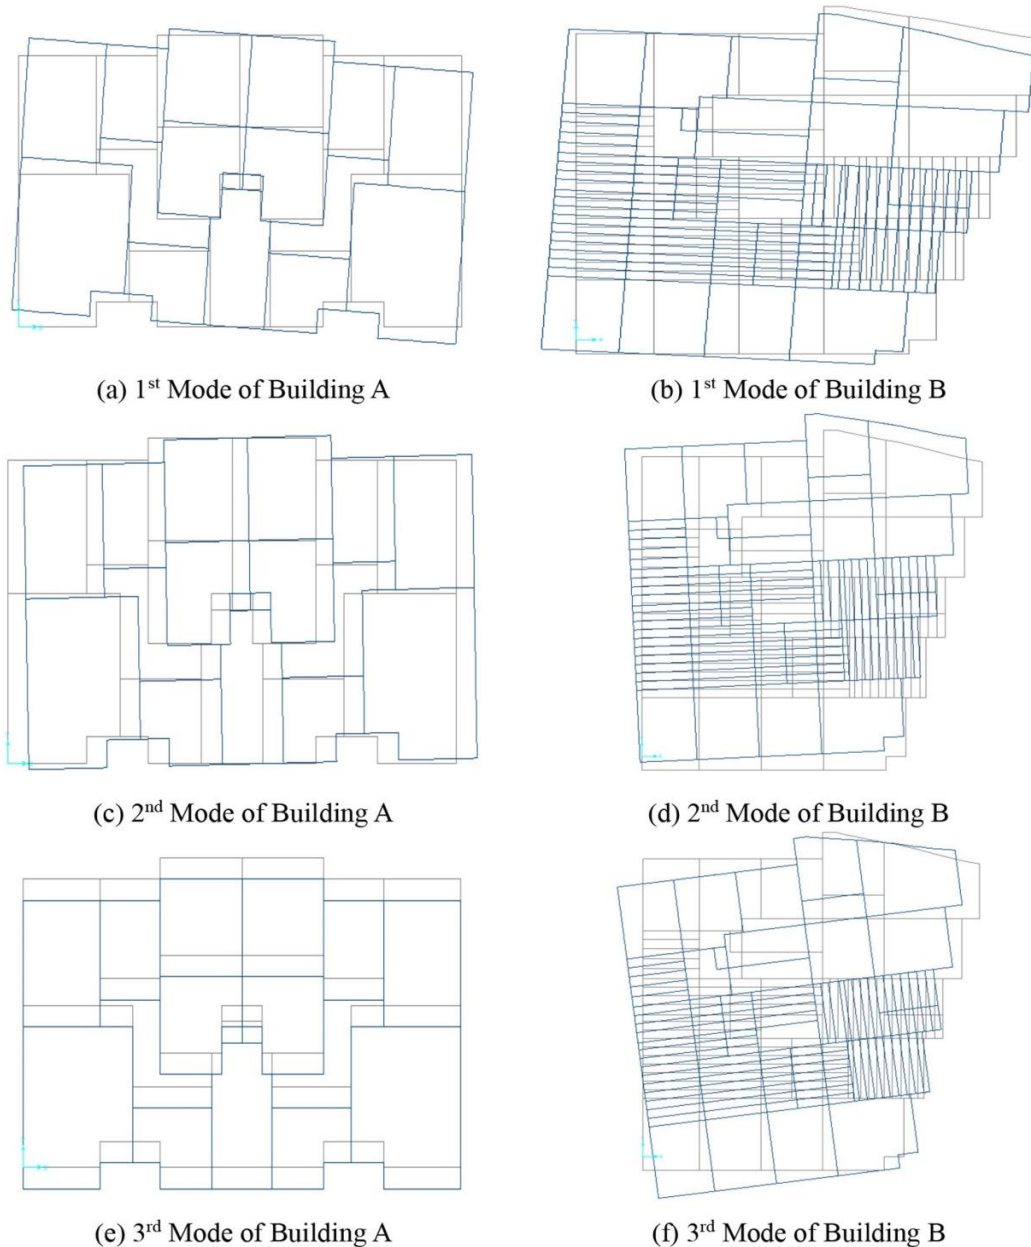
Mode shapes of Building A and Building B. (Ozkul et al (2019))
